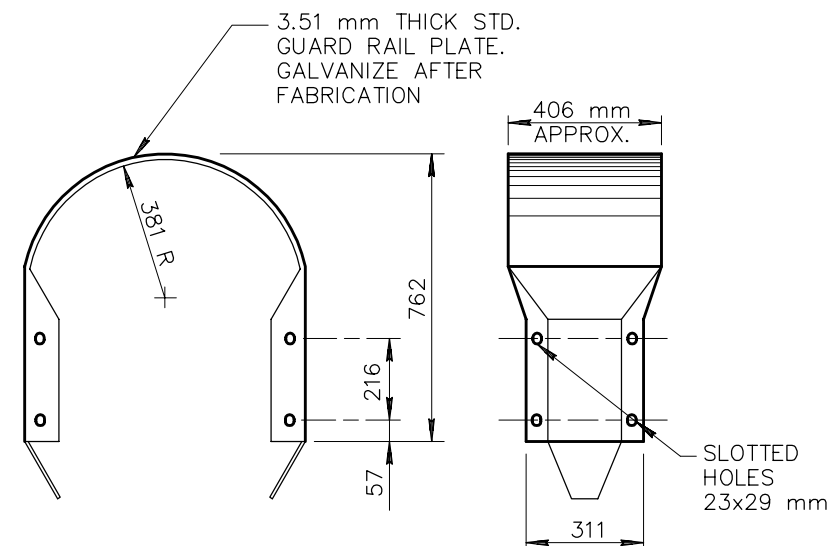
ATTACHMENT OF GUARD RAIL TO STRUCTURES
